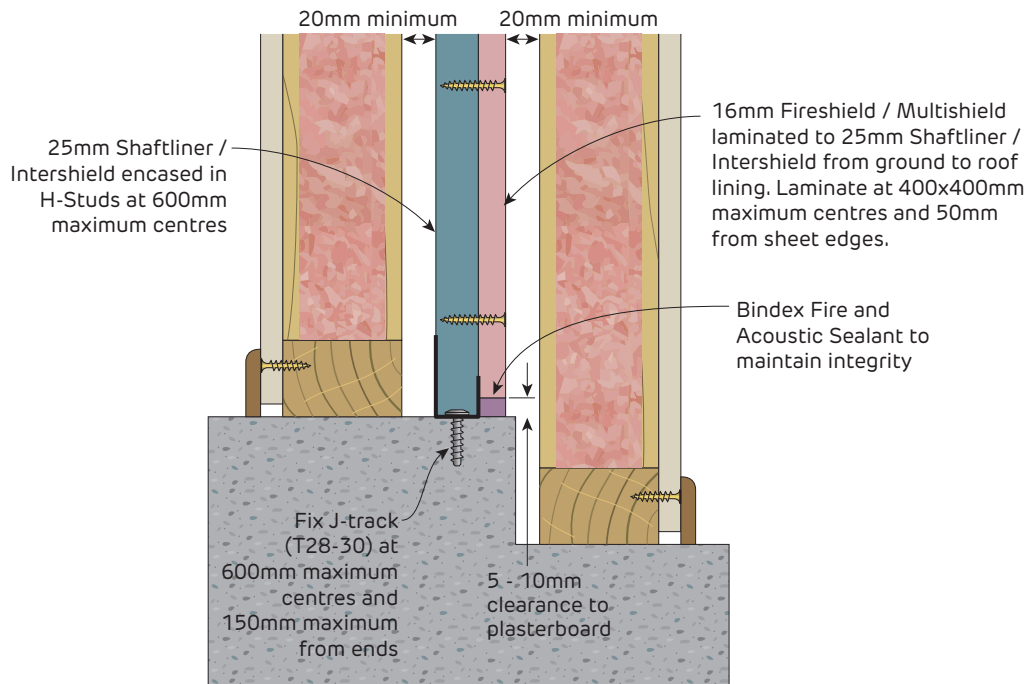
Interhome Wall Base to Slab with Step-Down
